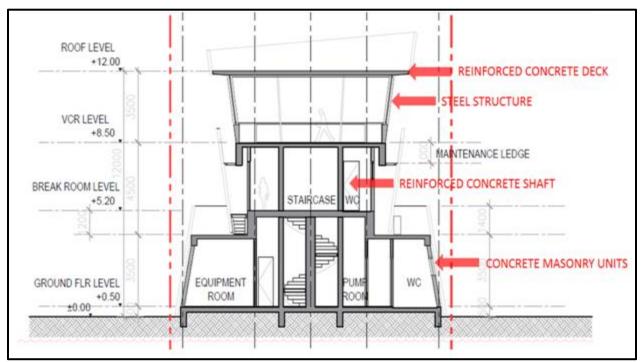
Proposed Munda Airport structural plan (Source: Egis 2023, Munda ATCT Design Report)
